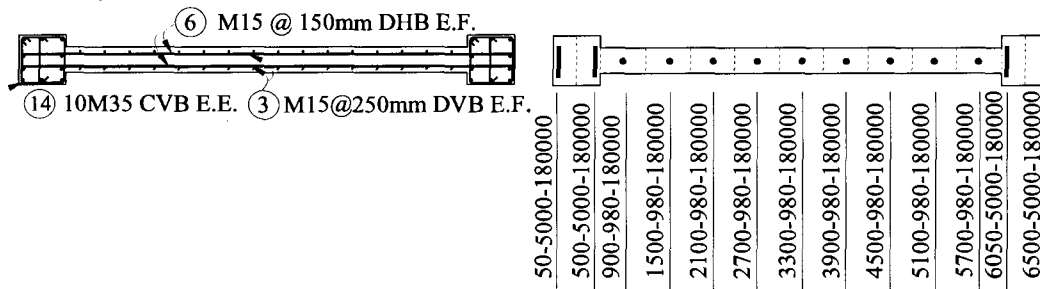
Modeling of shear wall sections for B12 located in Vancouver
